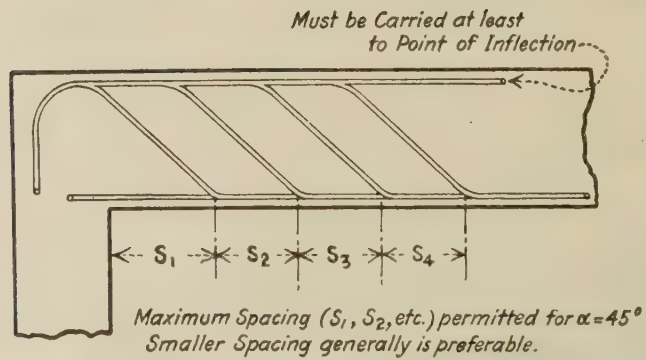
Typical Beam with Web Reinforced by Means of Series of Inclined Bars.
